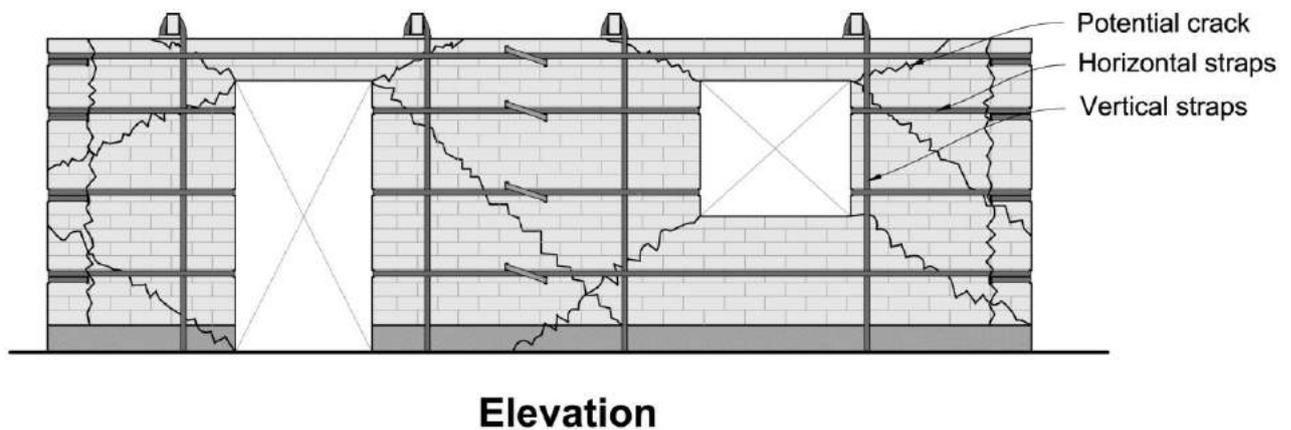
An elevation of a typical wall showing positions of expected cracks and strap placement that ensures at least one strap crosses every potential crack.
